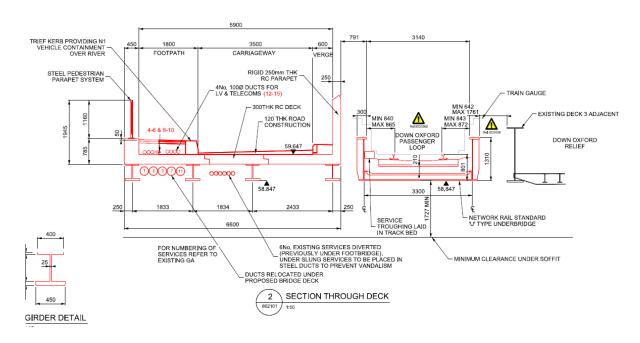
Cross-section of the new Sheepwash road and rail spans at the western extent.
